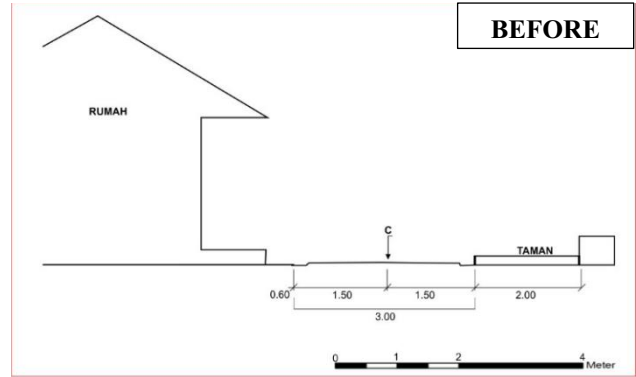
Construction of inlets and sidewalks on a 3.00-meter-wide road
